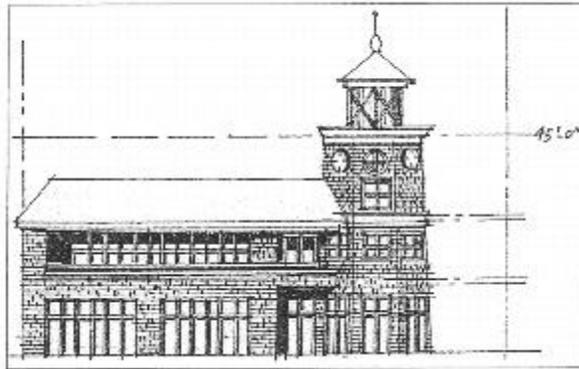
Example of vertical element and desirable building height for corner property on Highway 101. Note: building step-back not required on east side of Highway 101.
